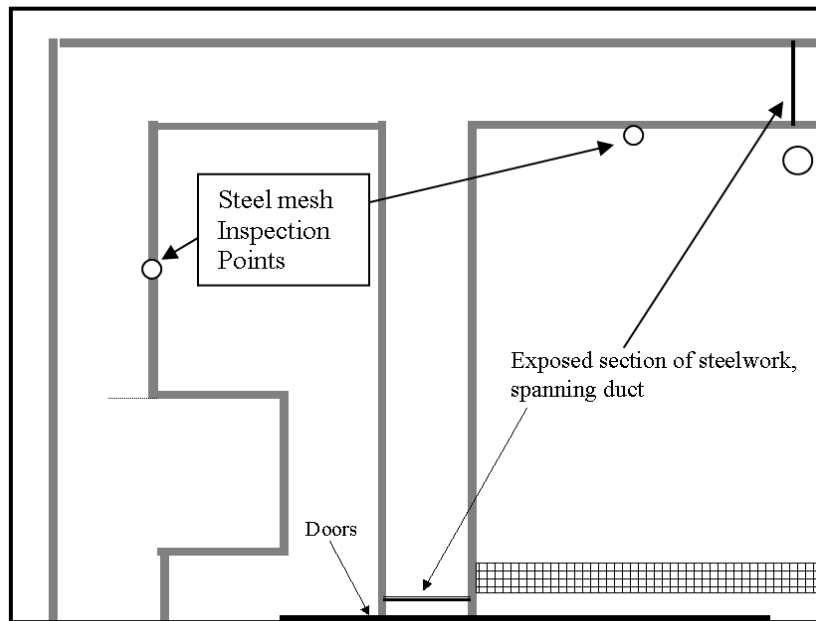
Reinforcing steel inspection and earthing points.
